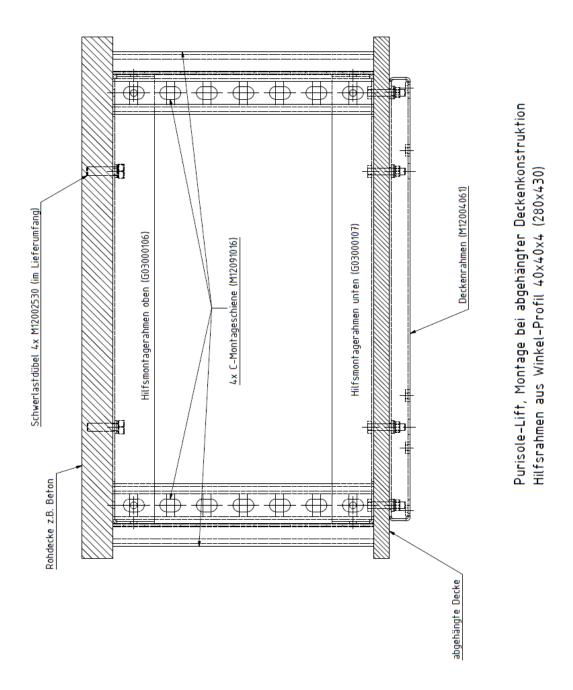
Purisole Lift, installation with hung ceiling structure, PL outside of hung ceiling
